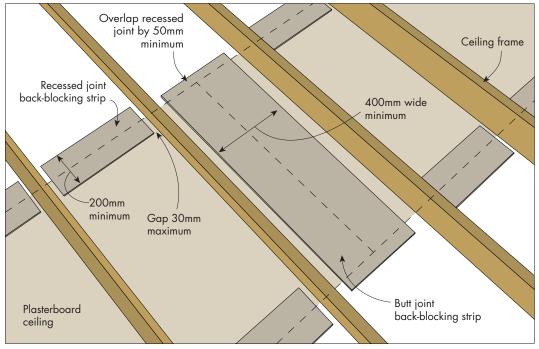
Placement of Back-Blocking Strips For Recessed and Butt Joints
